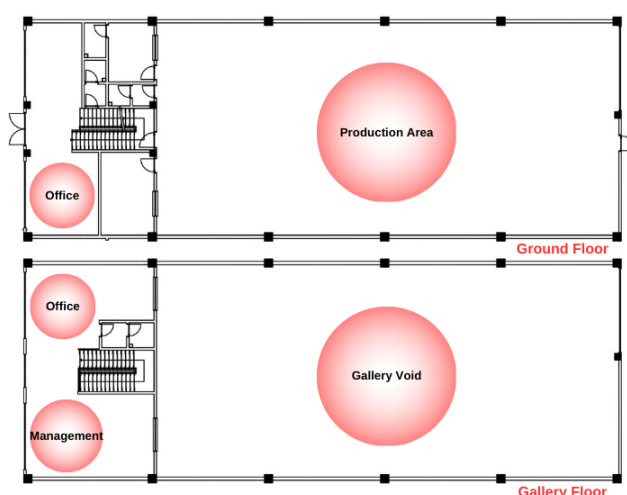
Project Area Ground and First Floor Plans. (Reference: Personal archive, 2022)
